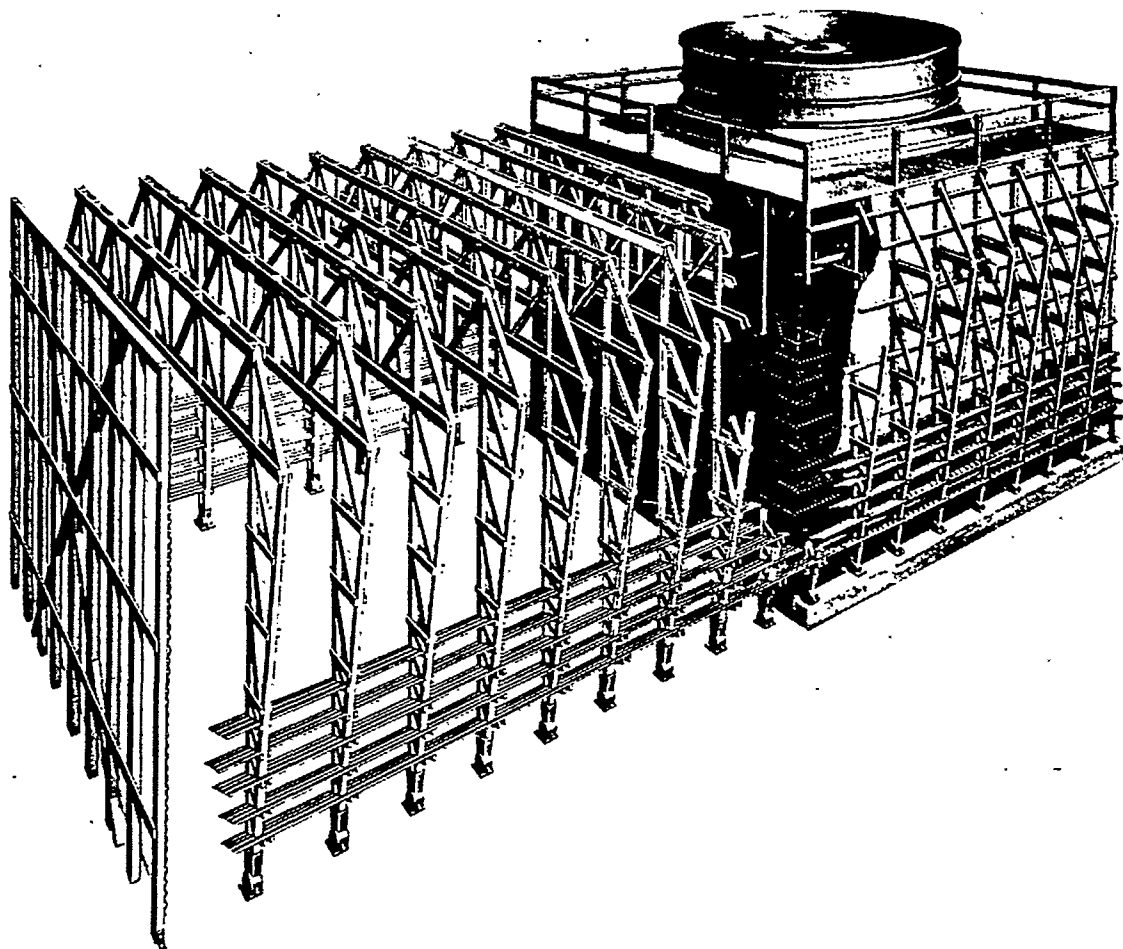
This telescope view shows how new design places all the support columns outside the cooling tower sheathing. Note white nylon rope hold fill grids in suspension
